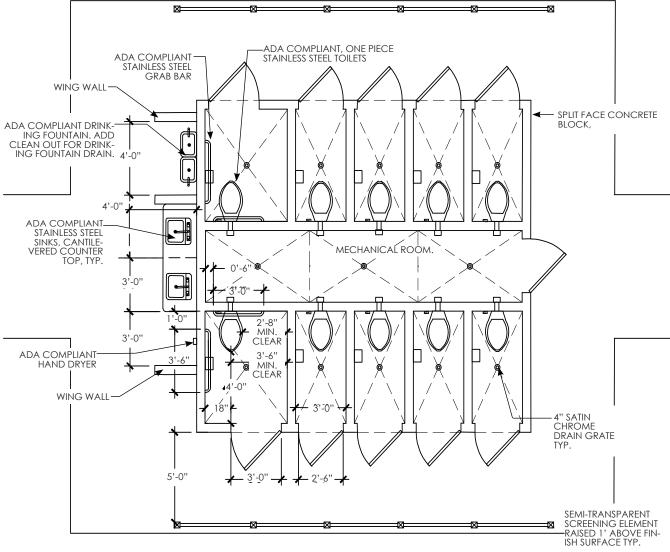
Preferred Restroom Building Layout Diagram (minimum 2 stalls)
